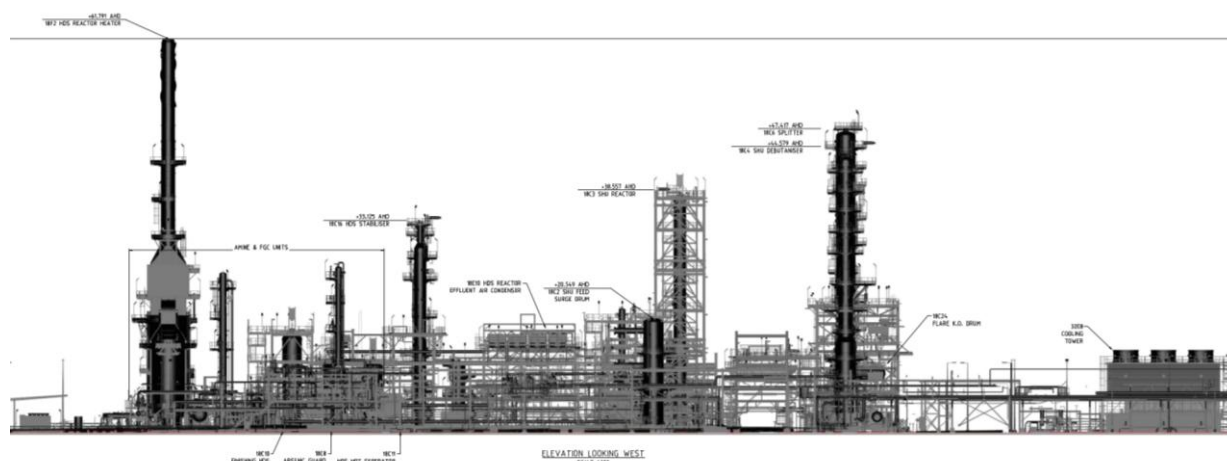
Proposed Modified West Elevation (Drawing XY21024-02-05-DWG-019, Appendix C)
